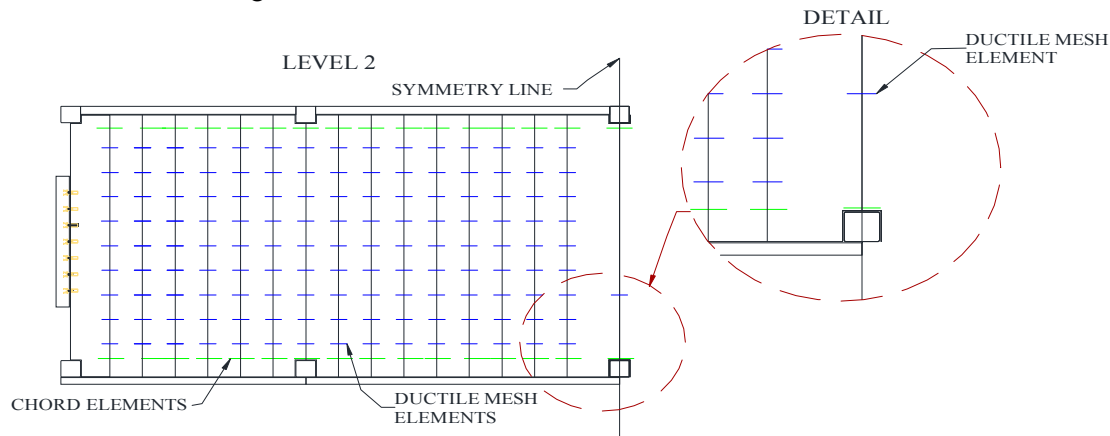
Ductile mesh reinforcement element layout in second floor.
